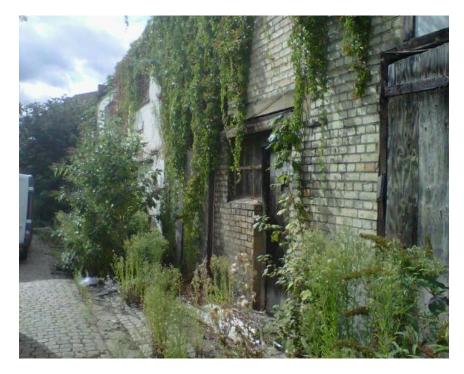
View of existing derelict buildings at the site looking along the Mews in SE direction.
